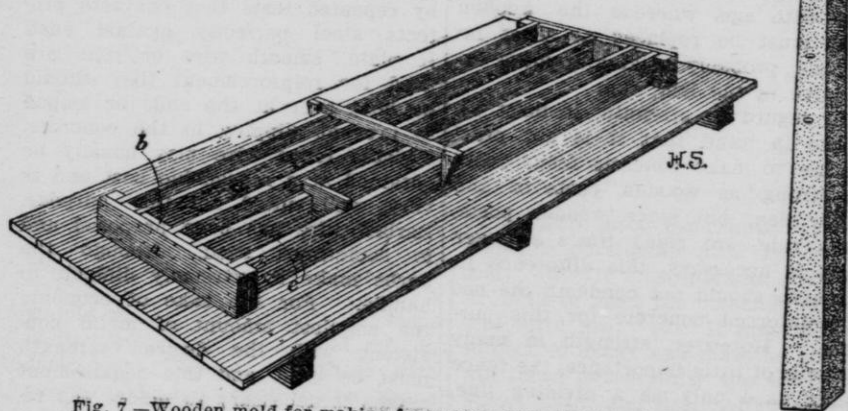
Wooden mold for making fence posts with two tapering sides.
